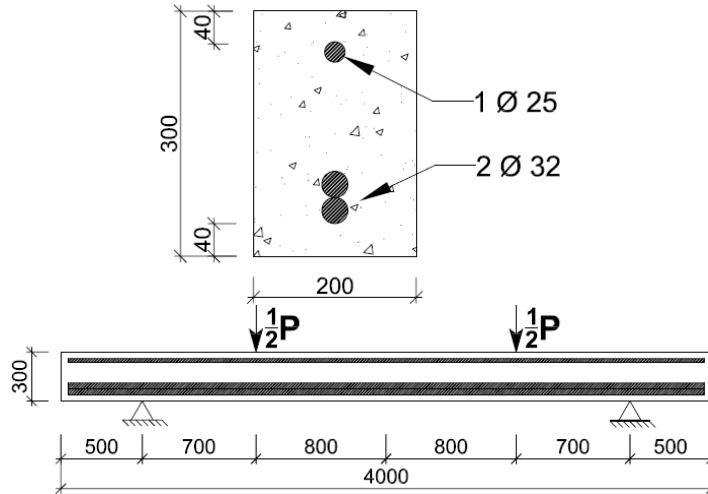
Cross section and test setup, large beam tests, shear failure. Dimensions in mm
